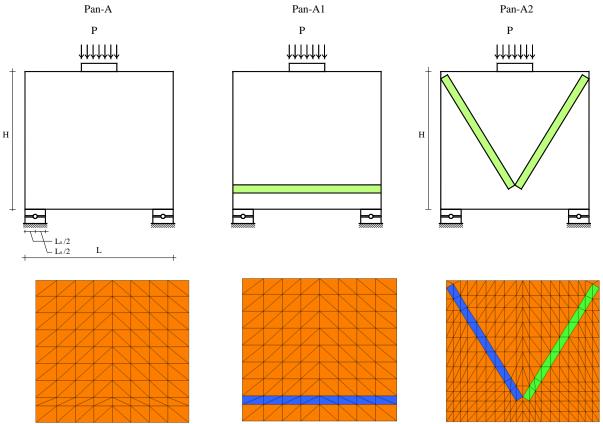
Masonry deep beam. Geometry, loading condition and FE discretization adopted for the numerical analyses.
